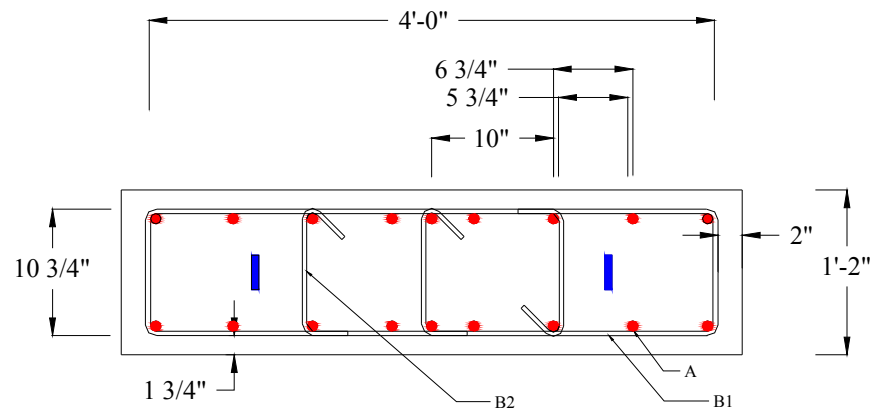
Structural Detailing of Concrete Reaction Frame – Section 2-2.
